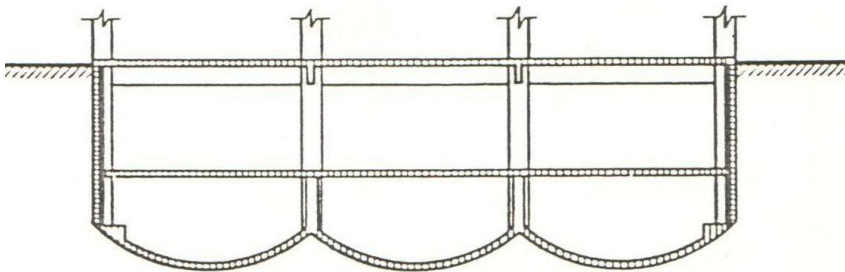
Shell raft foundation (Rosenblueth, 1984; Ejezie and George, 1987)
